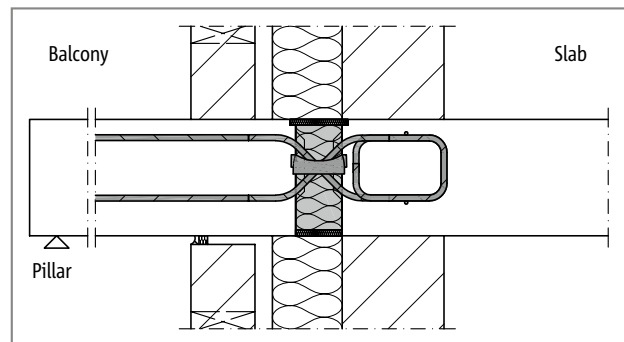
Schöck Isokorb® T type Q-E-W-VV: Connection for core insulation
